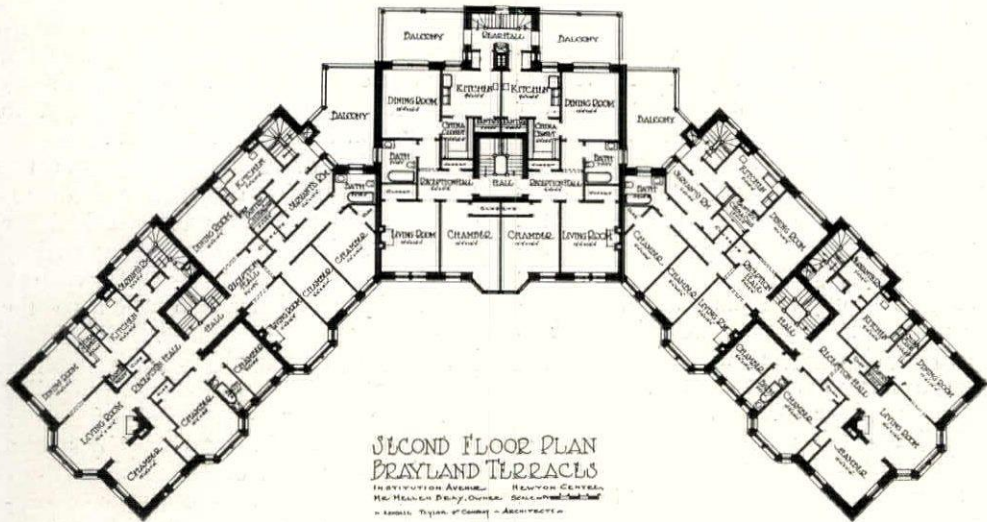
TYPICAL FLOOR PLAN—BRAYLAND TERRACES, NEWTON CENTER, MASS.
